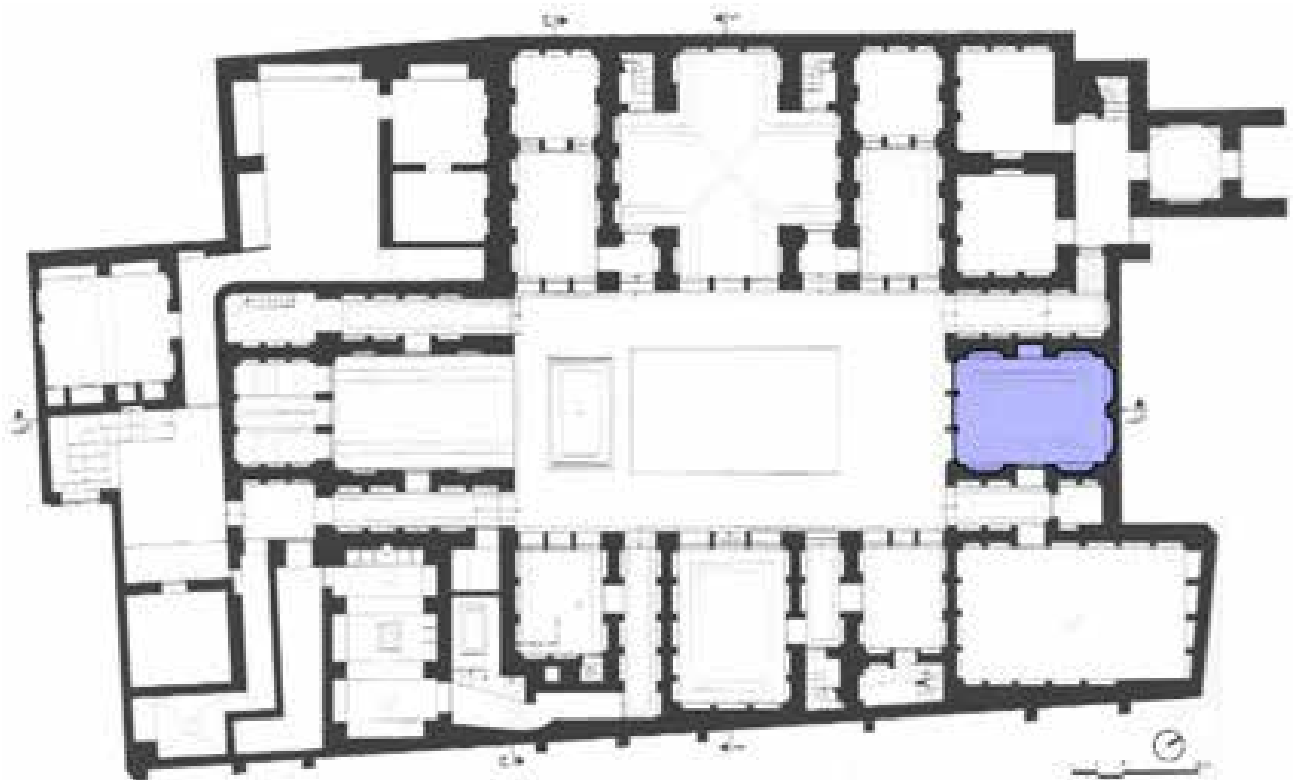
Ground floor plan of Tehrani's house and 3-door room. Source: Haji Ghasemi, 2004.
